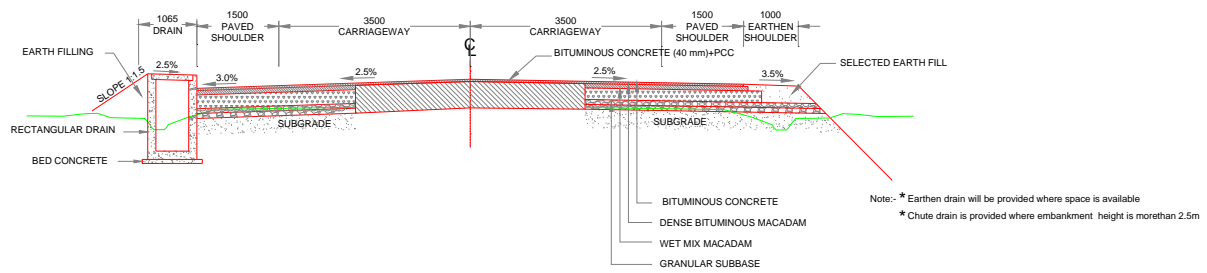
TYPICAL CROSS SECTION- TYPE-6
